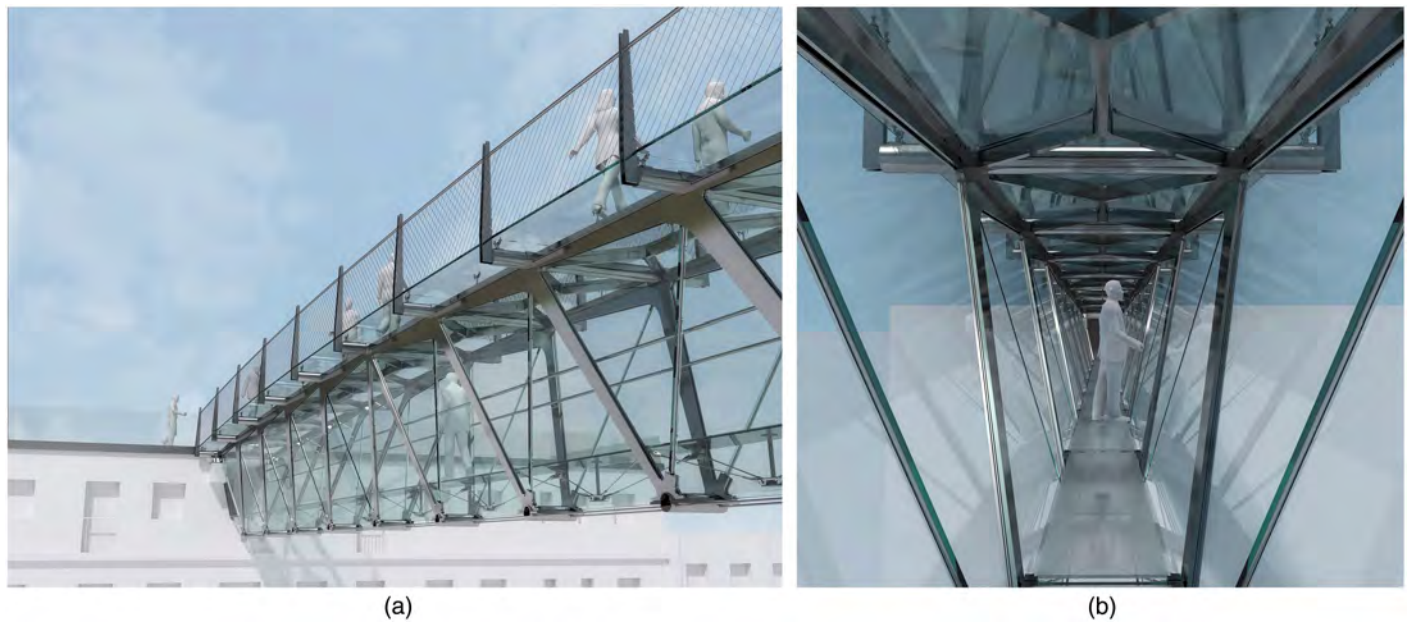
30-m span TVT δ footbridge: (a) side view; and (b) internal walk path view.
